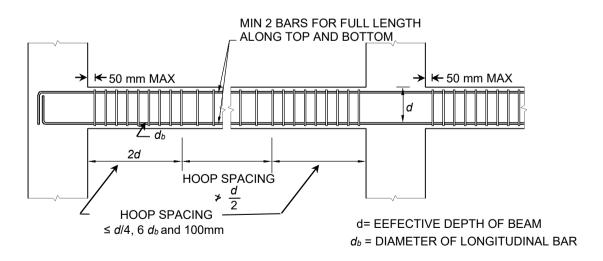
DETAILS OF TRANSVERSE REINFORCEMENT IN BEAMS
